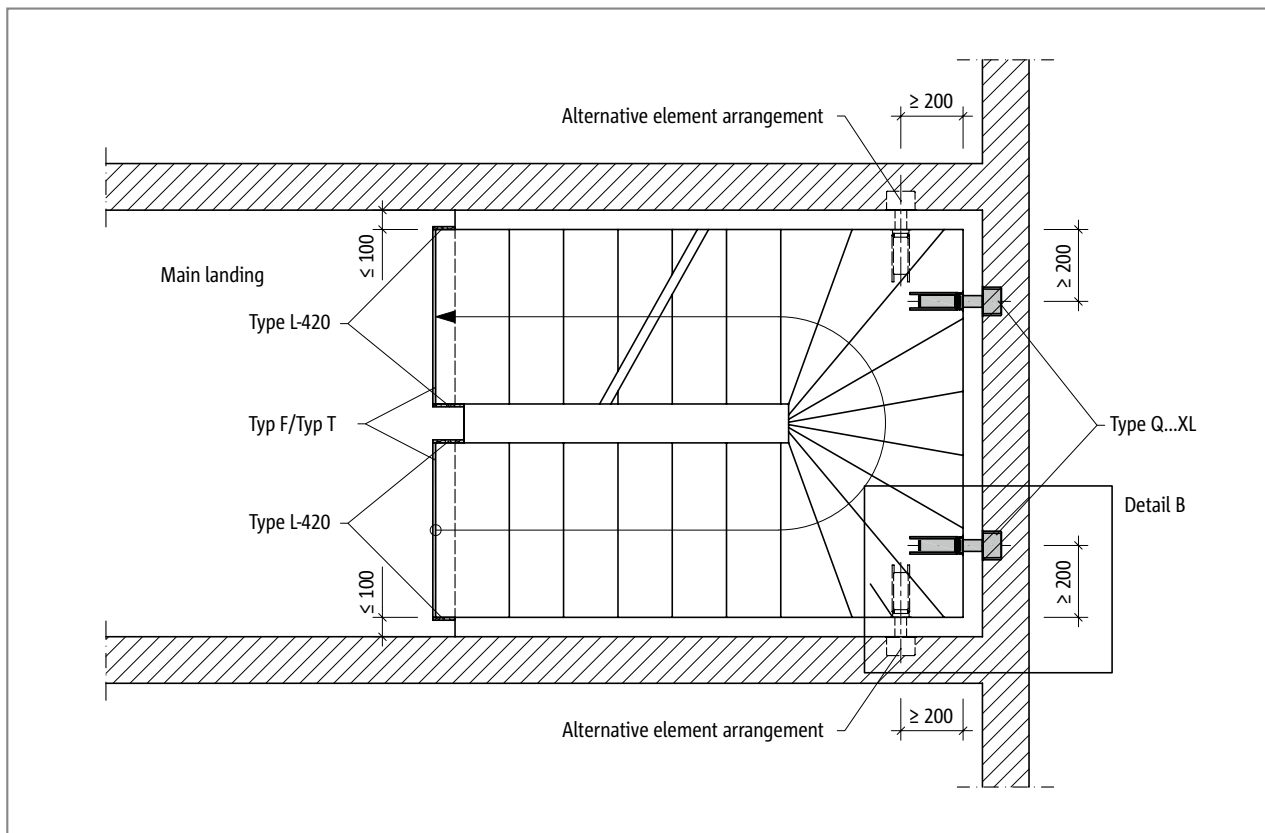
Schöck Tronsole® type Q...-XL: Component arrangement in the layout with a joint width of maximum 100 mm
